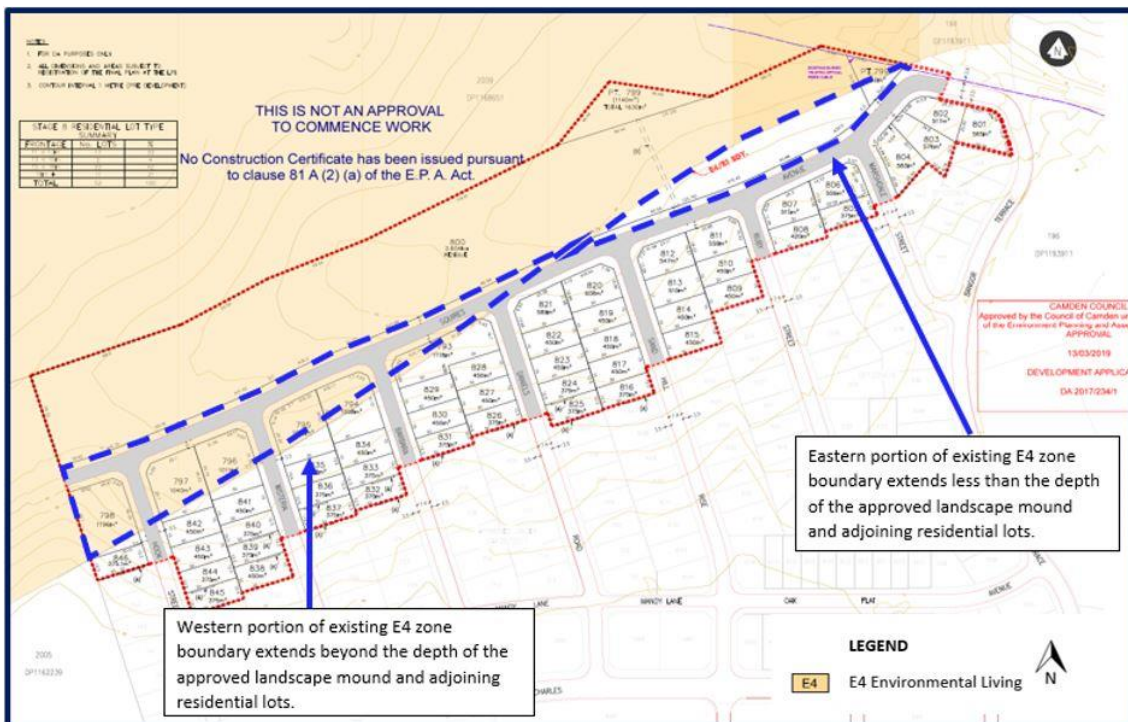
Approved Subdivision Plan for Stage 8 Arcadian Hills (DA/2017/234/1) and Current E4 Zoning Overlay
